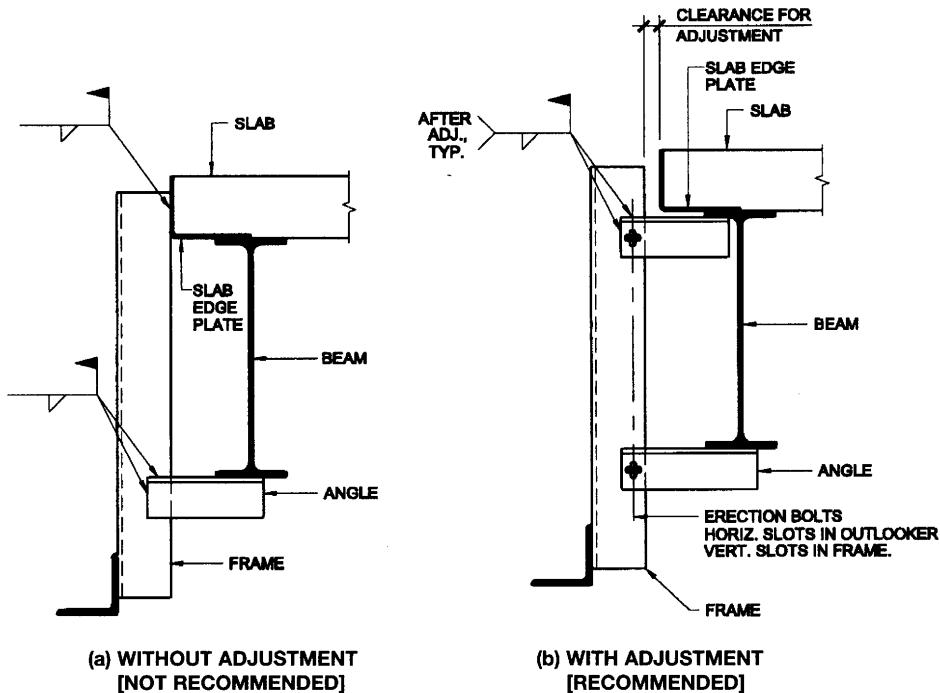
Attaching masonry façade systems to structural steel framing.
